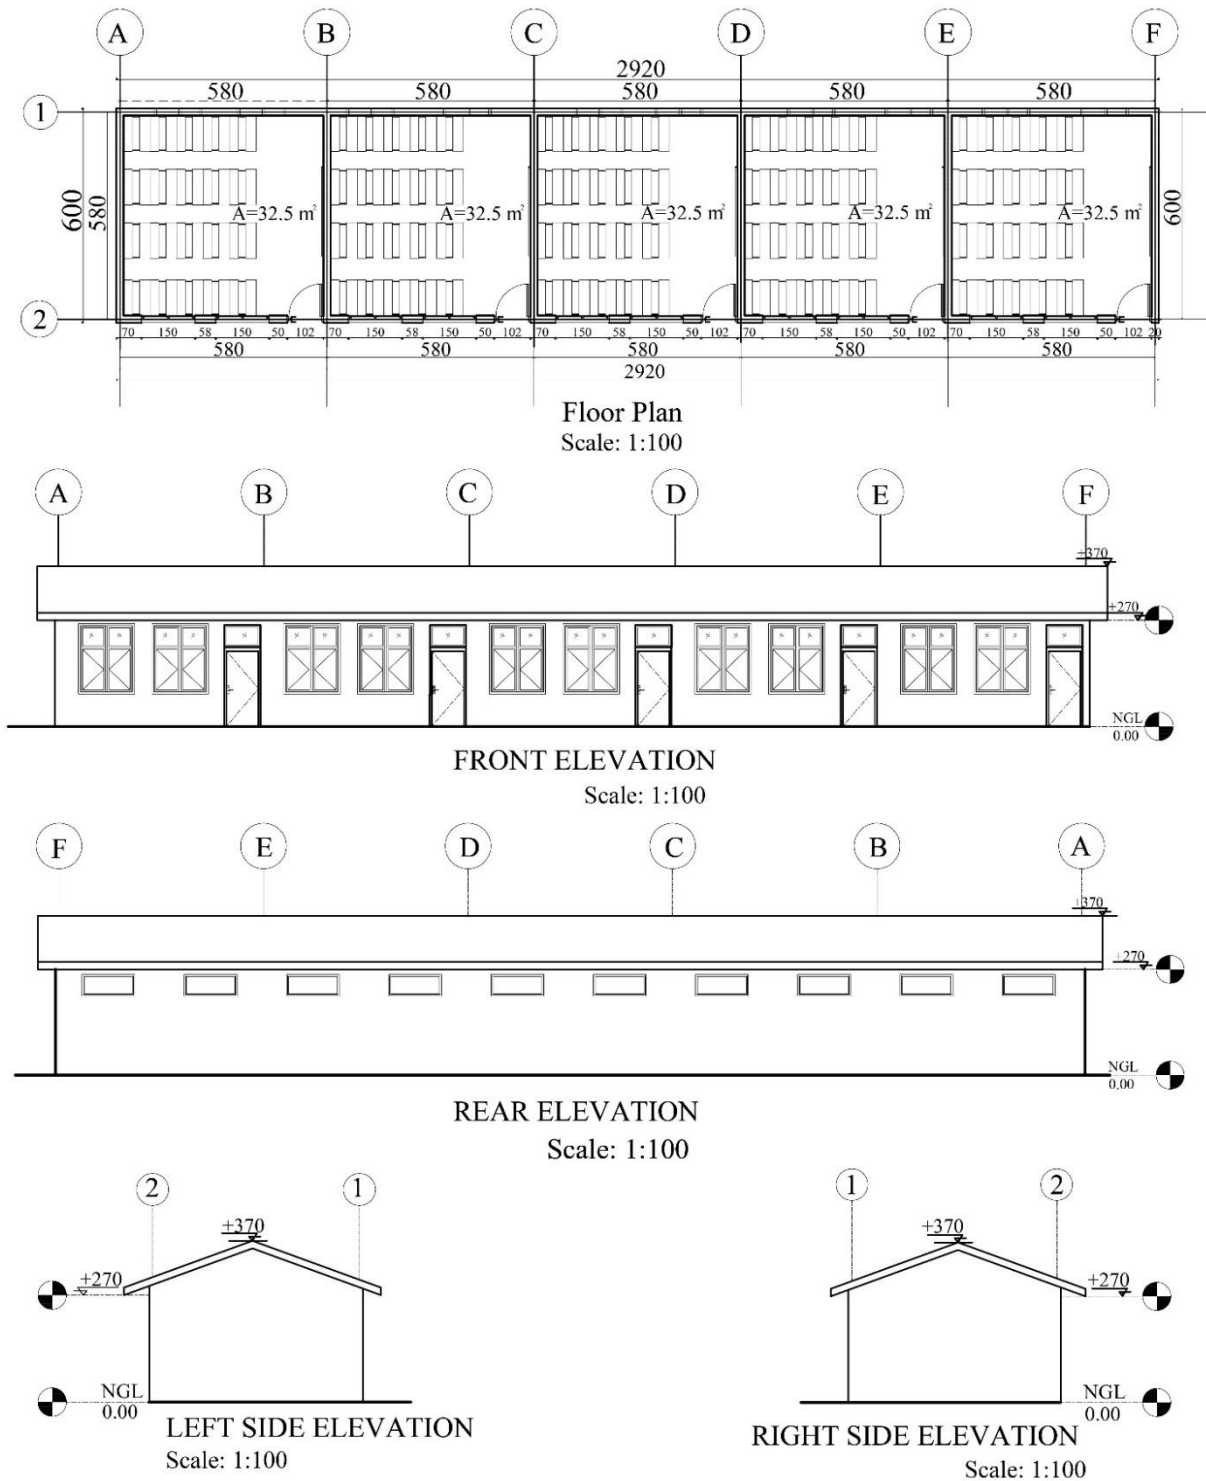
5 Sample layout of existing classroom building (Source: Author, 2024)
